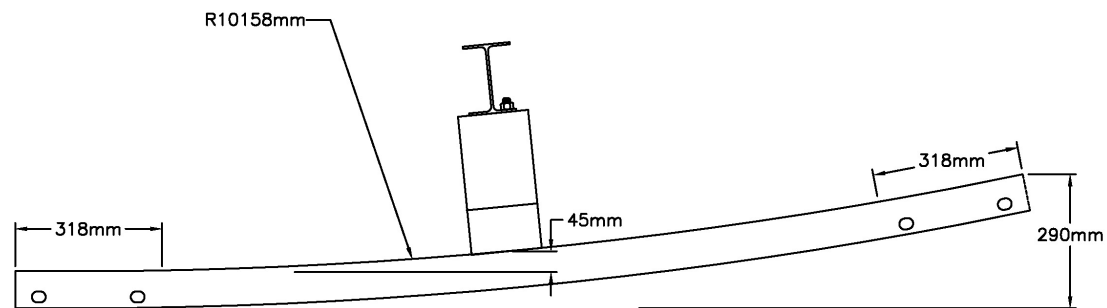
Anchorage Details, Design No. 3 (Metric)
